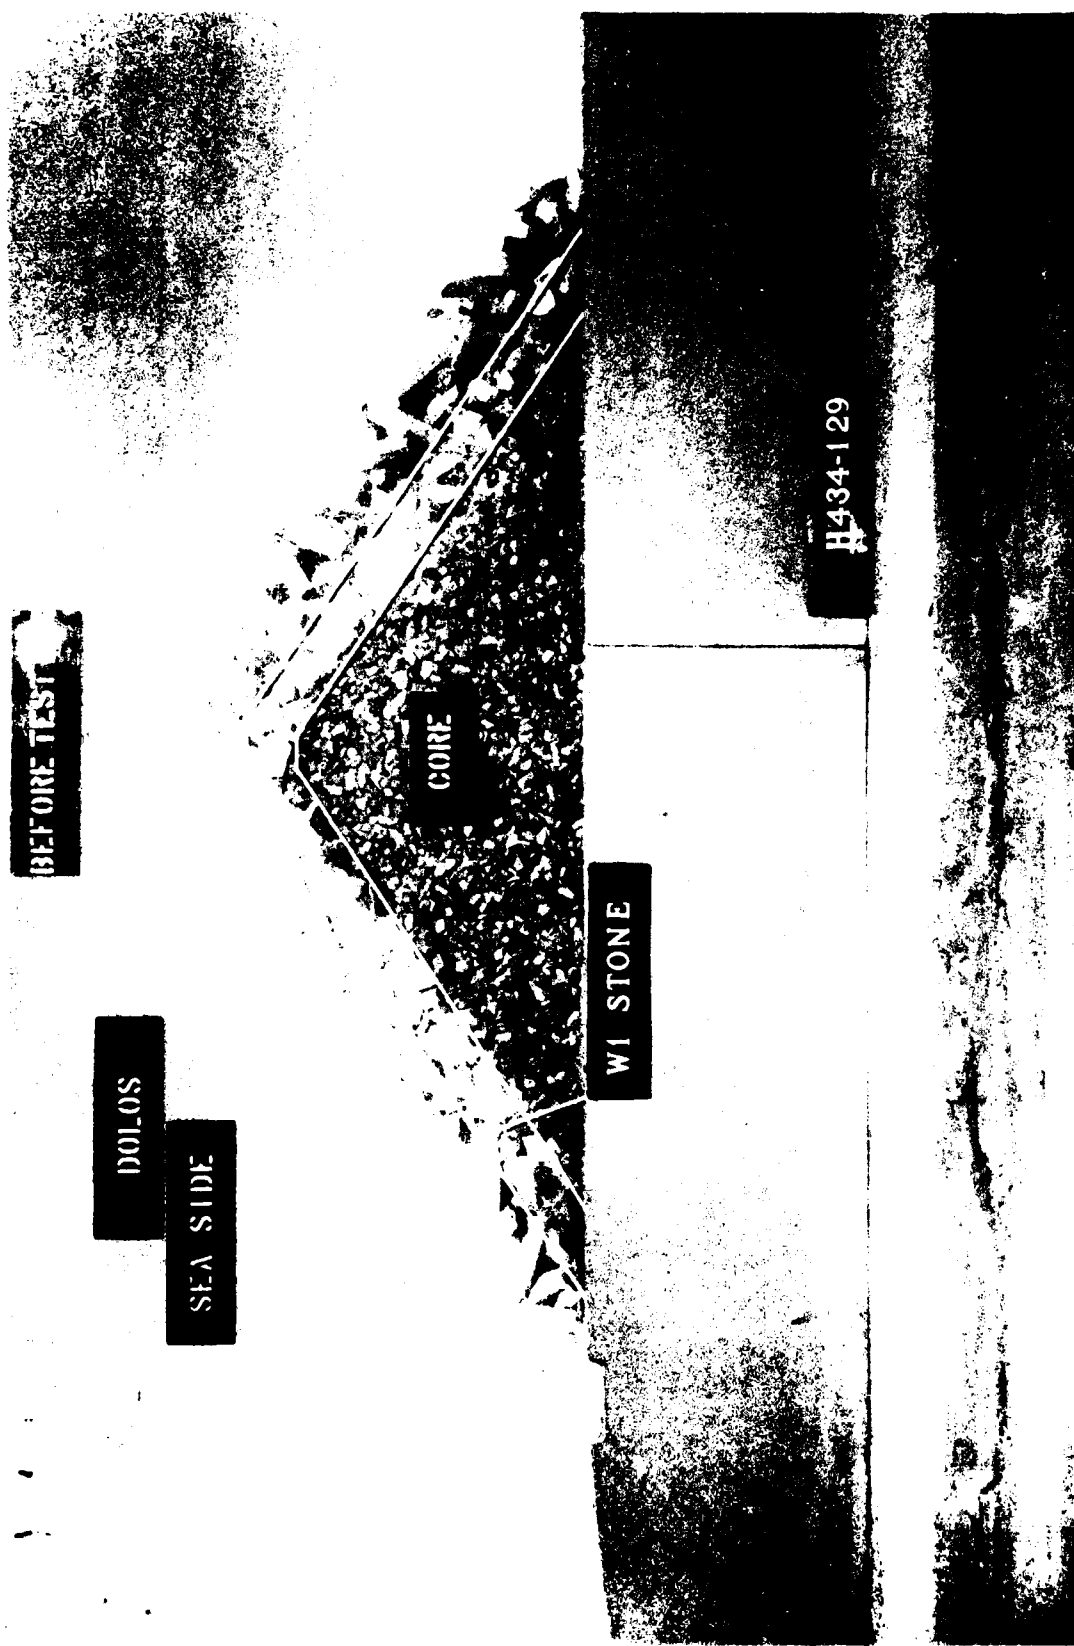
End view of a typical dolos section before wave attack at a LV-on-1.5H sea-side structure slope;  $W_a = 0.589$  lb
